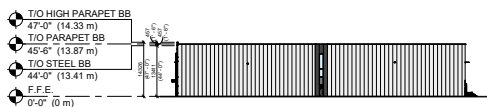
Industrial Building B West Elevation (typical concept design for industrial buildings on proposed site)
